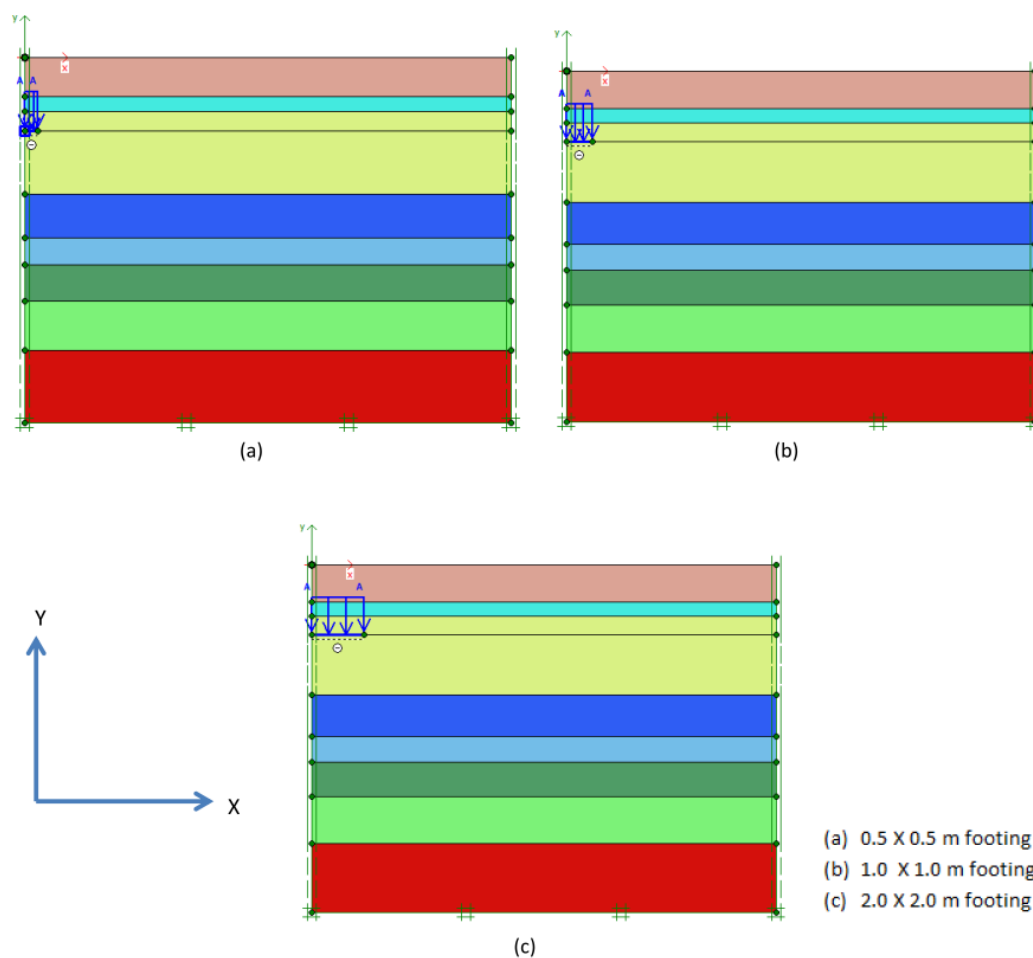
Footing model in PLAXIS at Tornhill footing load test site.
